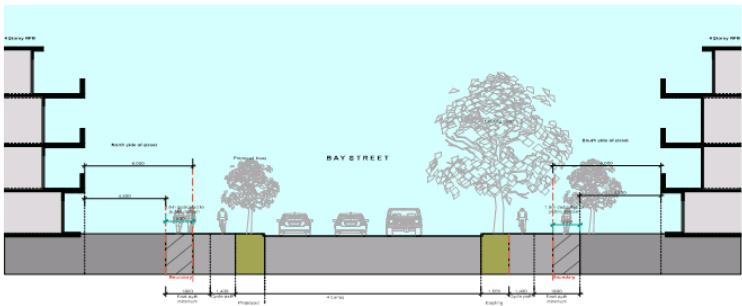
PROPOSED TYPICAL CROSS SECTION OF BAY STREET
